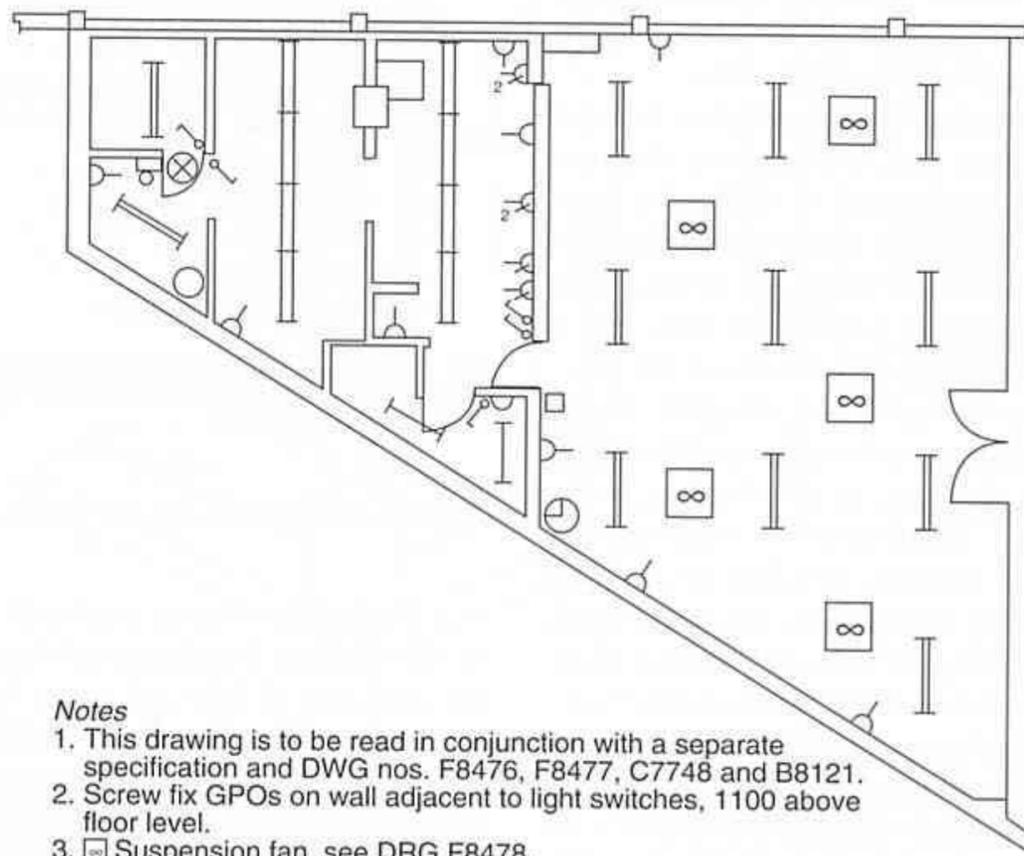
Floor plan showing the location of lighting and power outlets in a domestic installation
